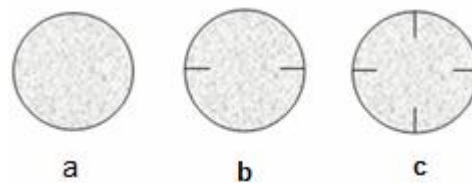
Suggested sections for CFT columns: (a) Simple, (b) with 2 stiffeners, (c) with 4 stiffeners
